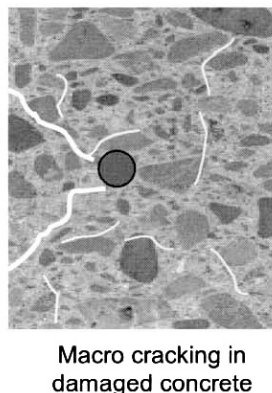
Cracking in frost-damaged concrete due to corrosion
